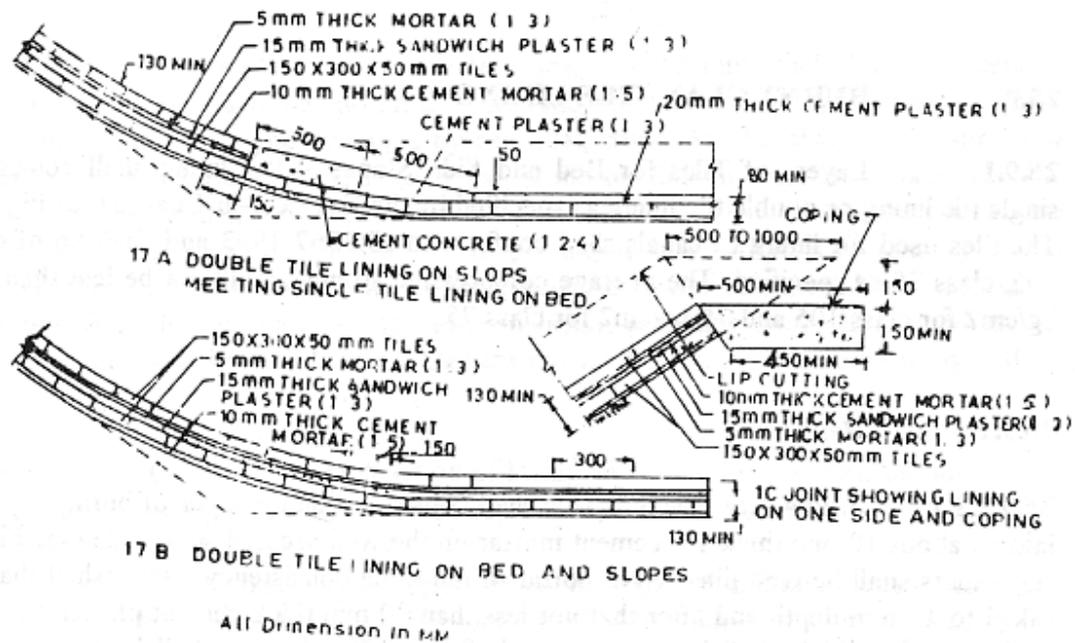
Typical Sketch Of Canal Lining With Burnt Clay Tiles
